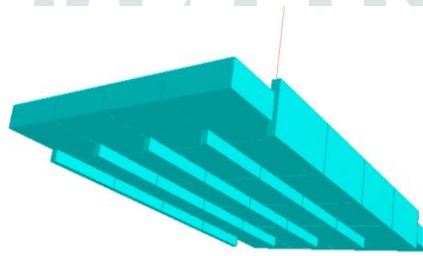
3D Rendered model of T-Beam bridge in Staad Pro
